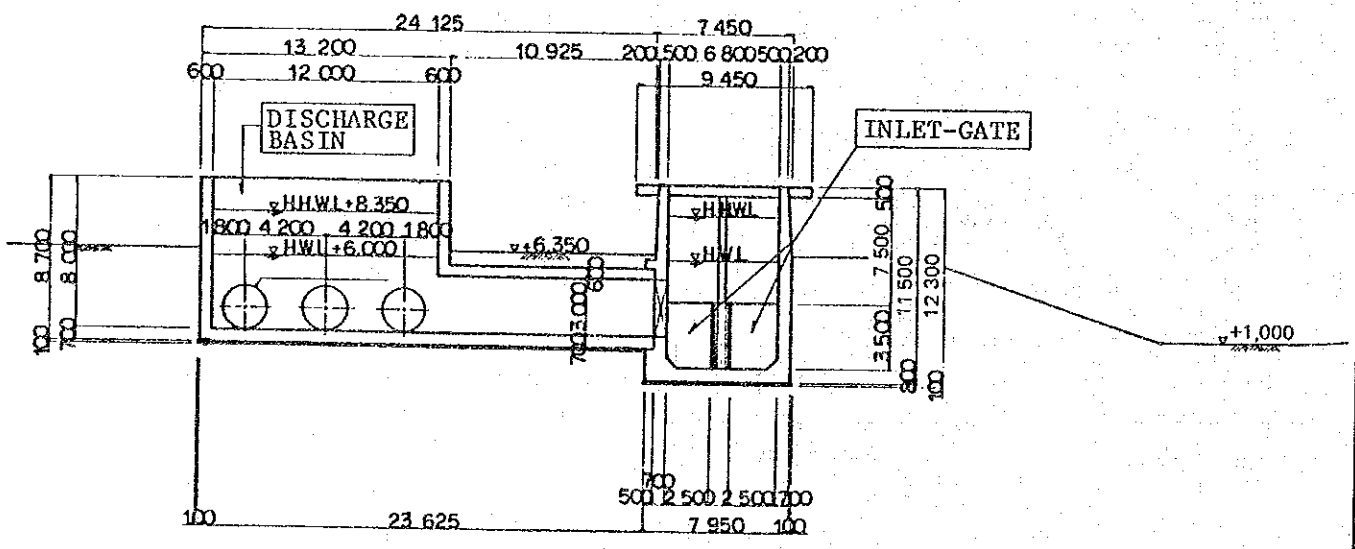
TYPICAL DESIGN OF PUMP STATION (2)
